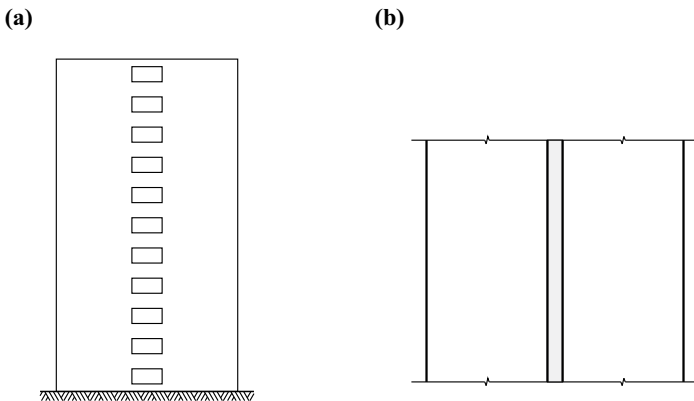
Shear wall connection: (a) wall with openings, (b) coupling joint
